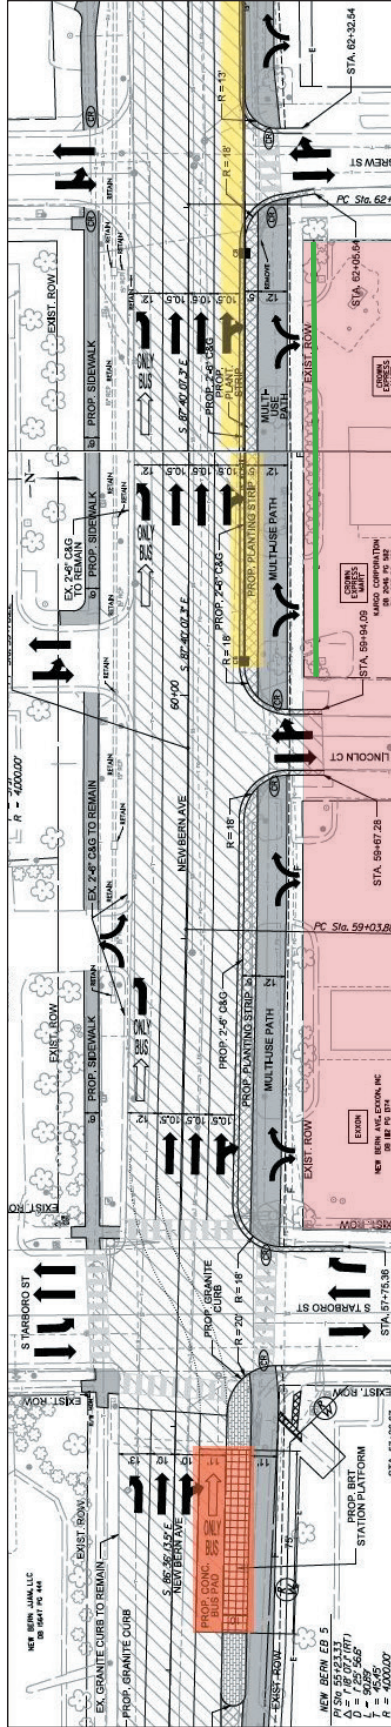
Multi-Use Path and Temporary Construction Easement (green) adjacent to Lincoln Terrace, Wake BRT New Bern Corridor Preliminary Plans, Sheet R-NBN-039 and Sheet R-NBN-040, 2020
